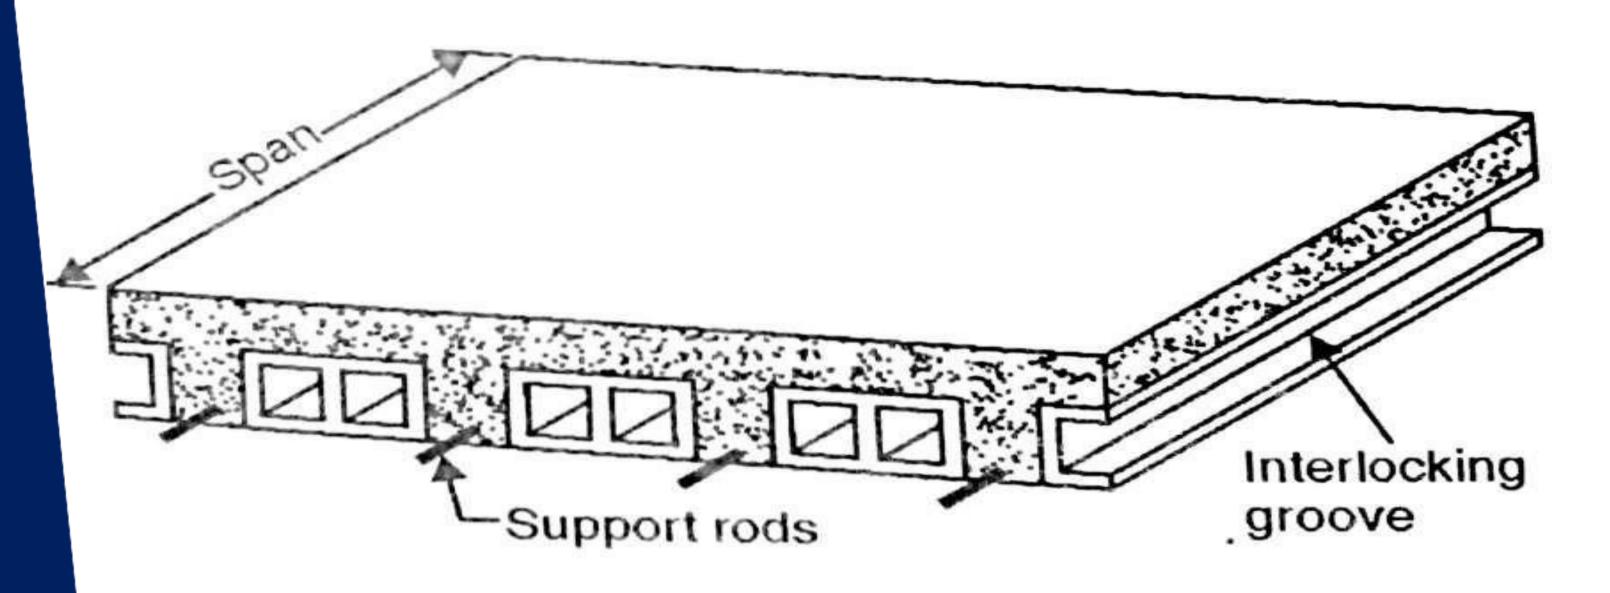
HOLLOW PRECAST FLOOR UNITS.
